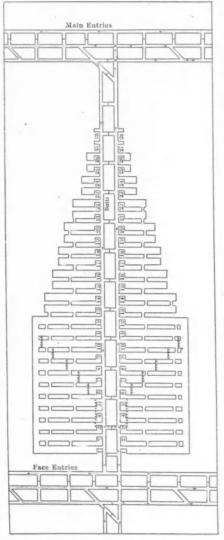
FIG. I. GENERAL SYSTEM OF WORKING ON THE RETREATING ROOM-AND-PIL-LAR PLAN
